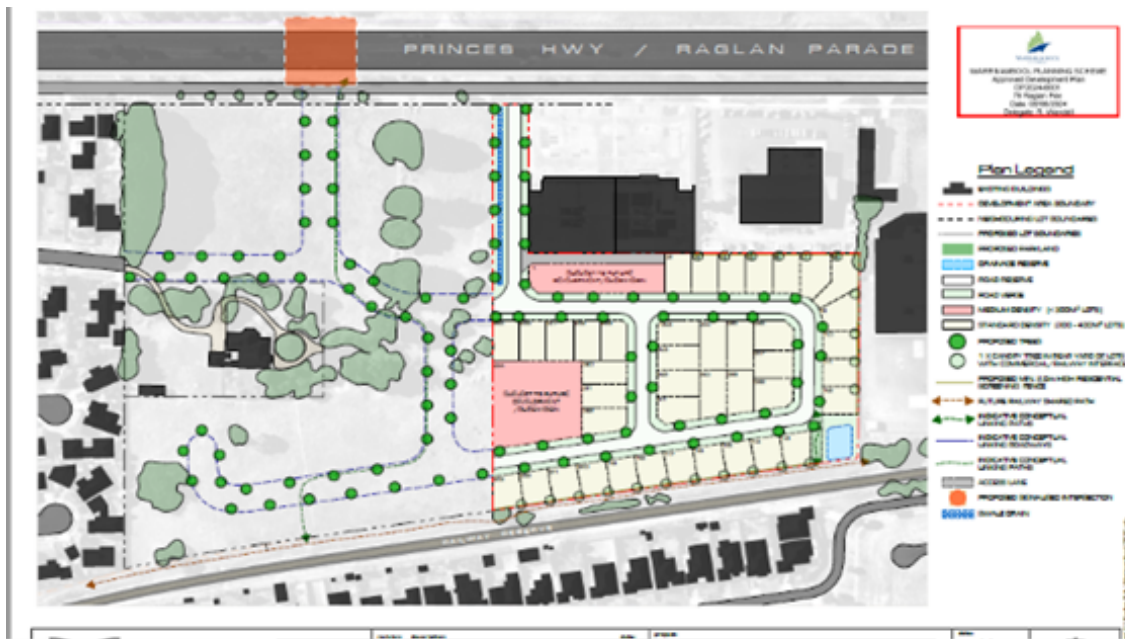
Development Plan and indicative layout for 83 Raglan Parade
